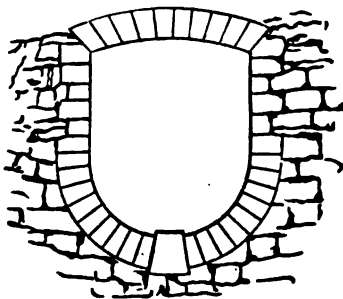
is an elevation of a culvert with an arched top and an inverted arched bottom.
